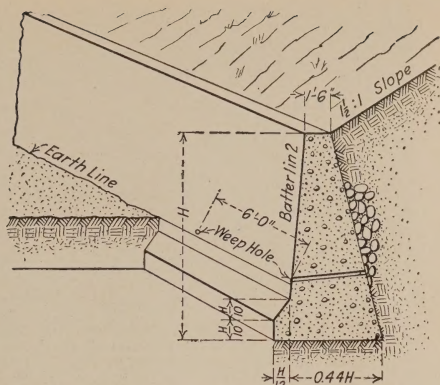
Cross section of retaining wall 10 feet or less in height. Letter "H" means height of wall; other dimensions are given in terms of height.
